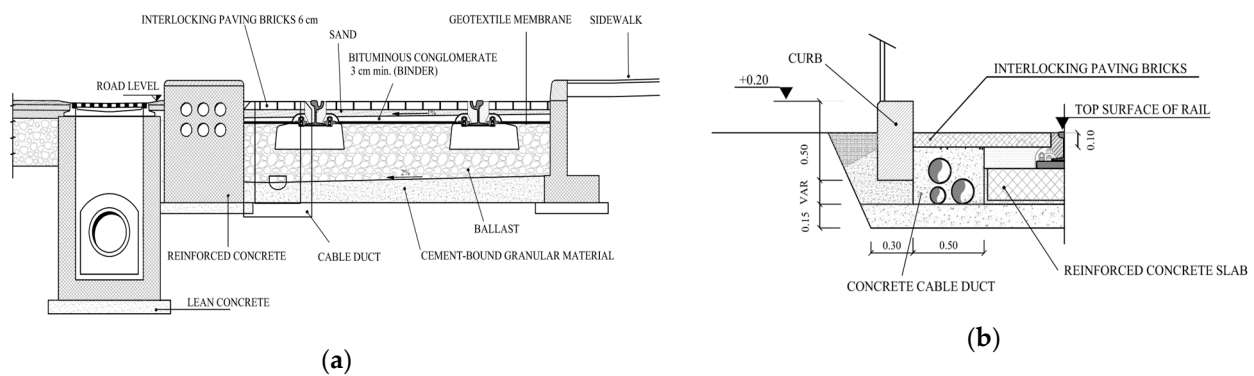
Tramway track details: (a) ballasted track and (b) slab track.
